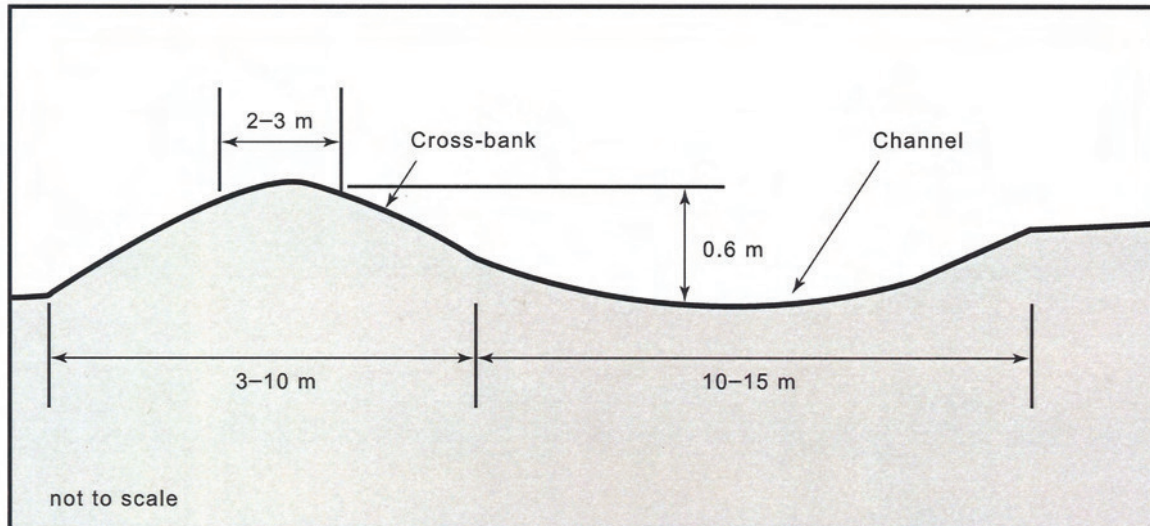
Cross bank dimensions (Source: Managing Urban Stormwater; Soils and Construction – Volume 2C Unsealed Roads).
